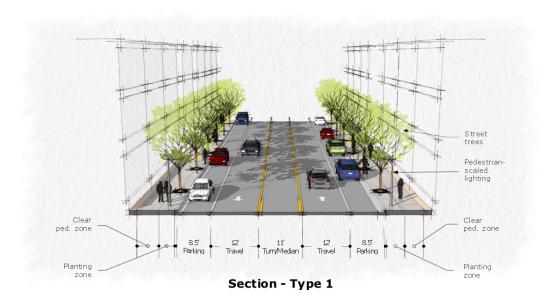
Configuration and dimensional requirements for street section "Type 1" areas identified in the Street Section Plan.
